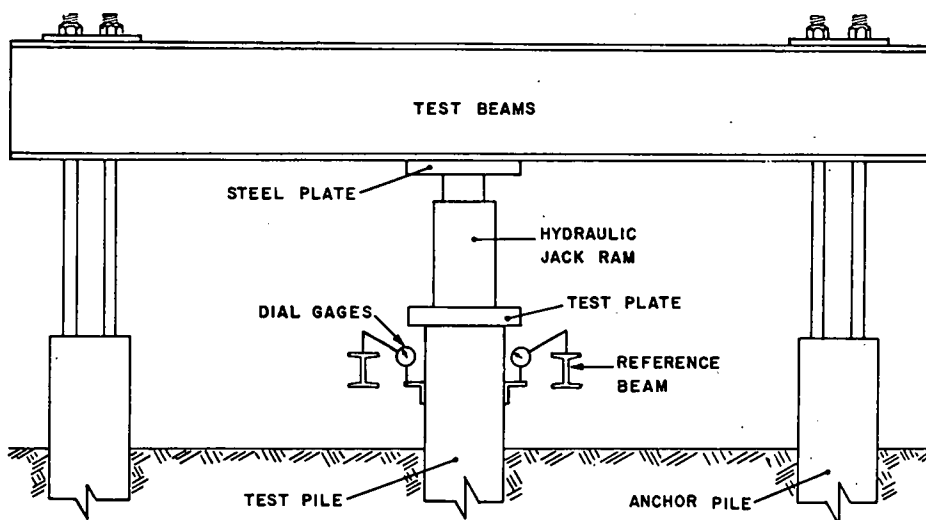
Typical setup for pile load testing in axial compression using anchor piles (214).
